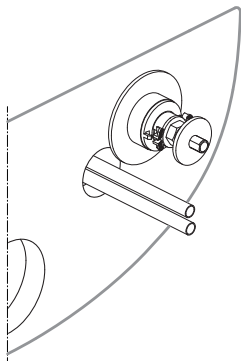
Rear view of panel with wash basin mounted. Hole shown for copper pipes. Trim pipes to length.
